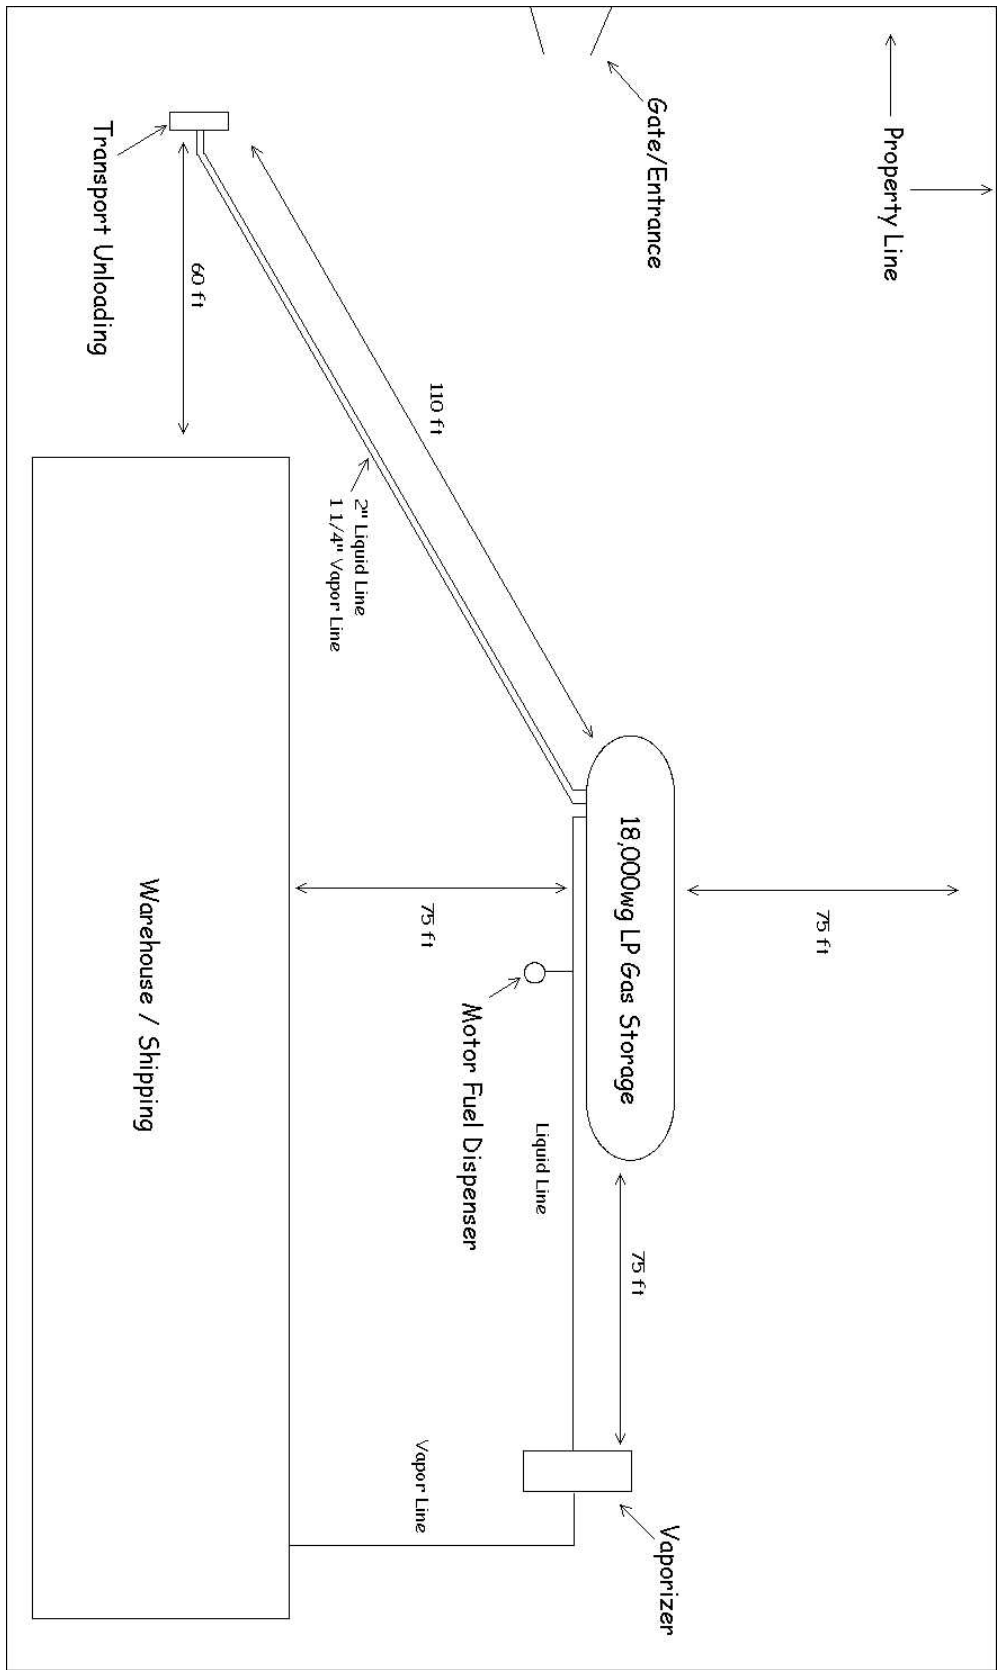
Schematic plan view of a LP-Gas facility used in Example 2
